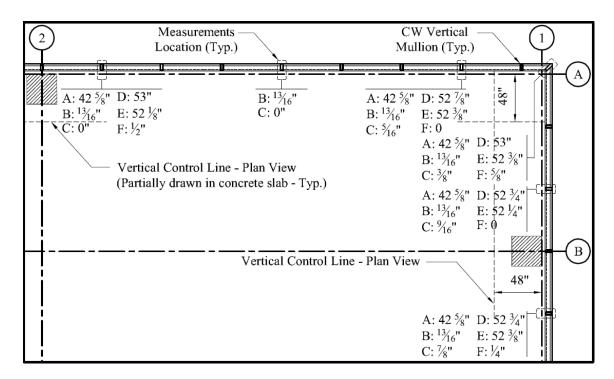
Example of data collected from 2nd to 7th floor. Letters A, B, C, D, E and F denote de measurements gathered in the field according to the façade section showed in Figure 9. Partial floor plan (Typ.). Adapted from Dietzmann, J. M., Jr. (2014).
